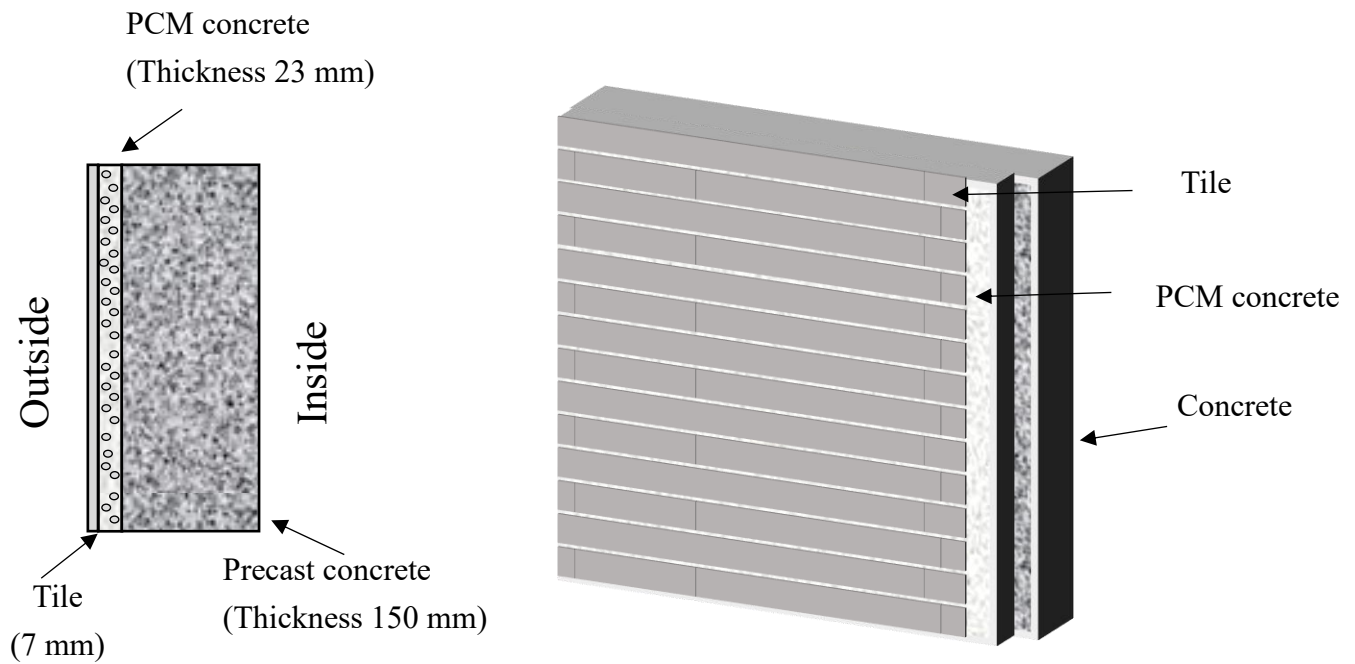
Way of applying PCM into precast concrete wall panels.
